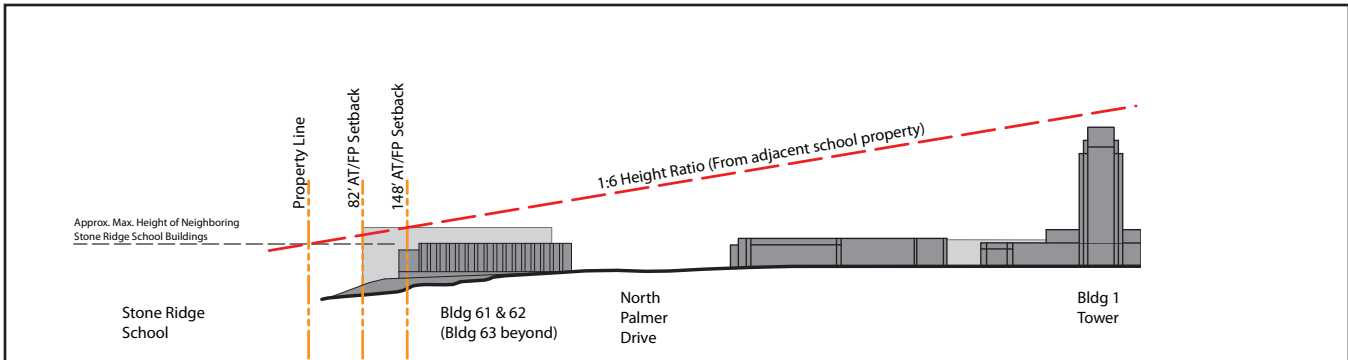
SECTION A-RECOMMENDED BUILDING ENVELOPE FOR NORTHWEST CAMPUS AREA- VIEW TOWARD EAST
